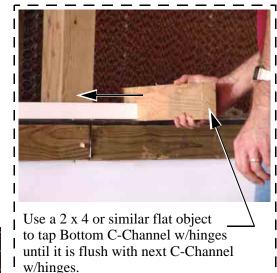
Attaching the Second 10' Bottom C-Channel w/Hinges
